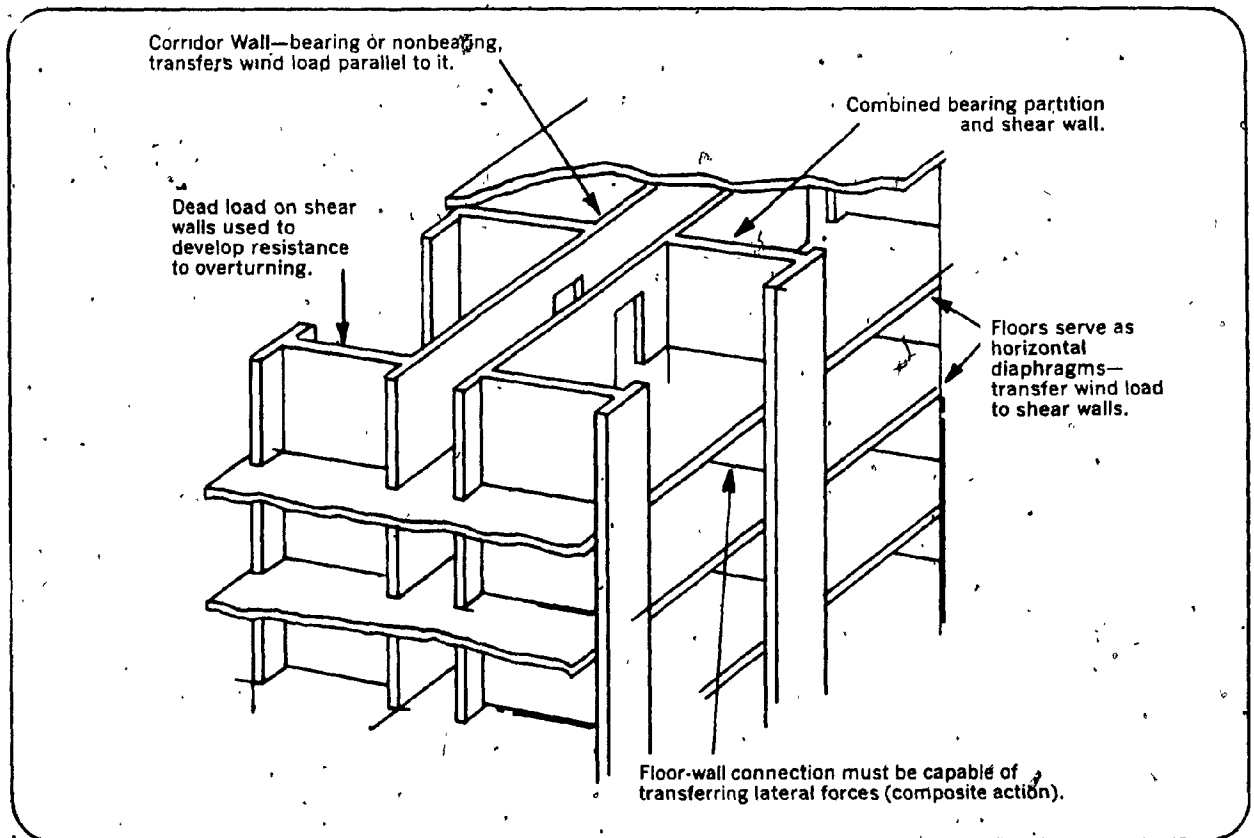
Engineered Concrete Masonry Load-Bearing Wall Building.
